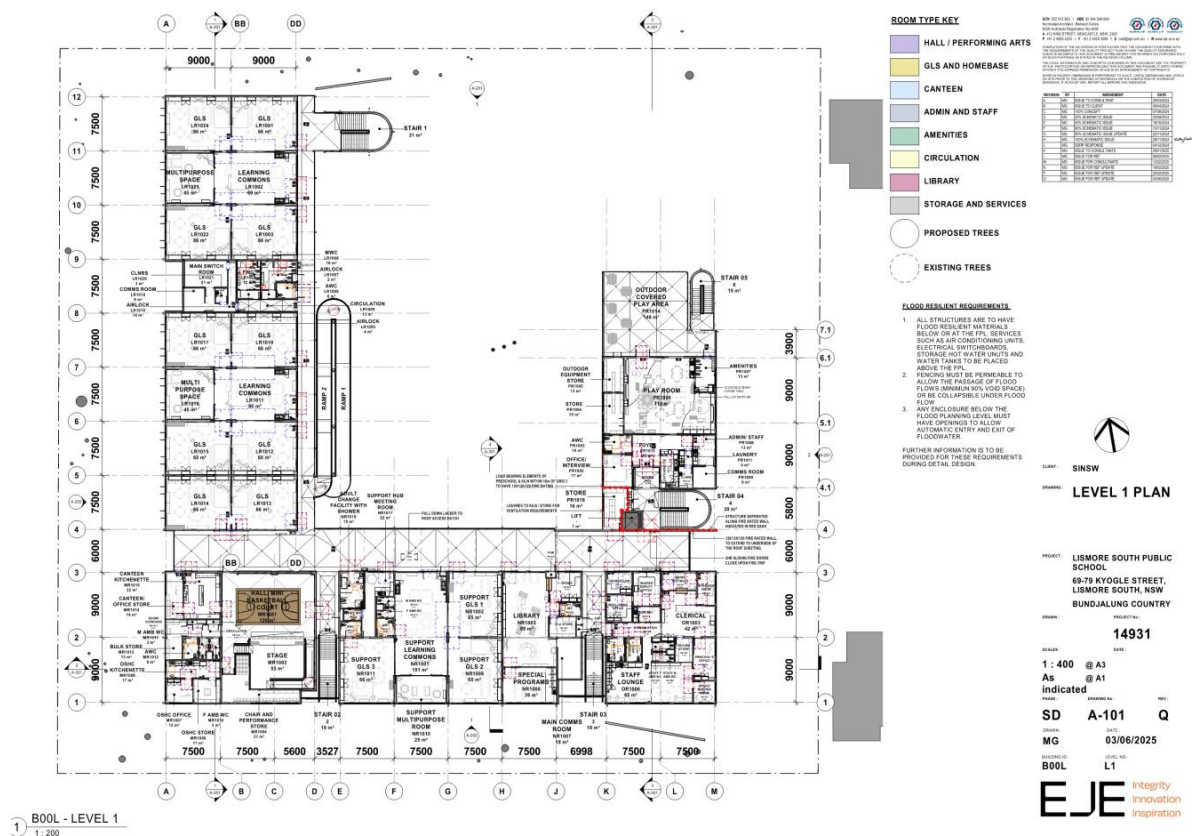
Proposed Level 1 Floor Layout (Source: EJE Architecture)
